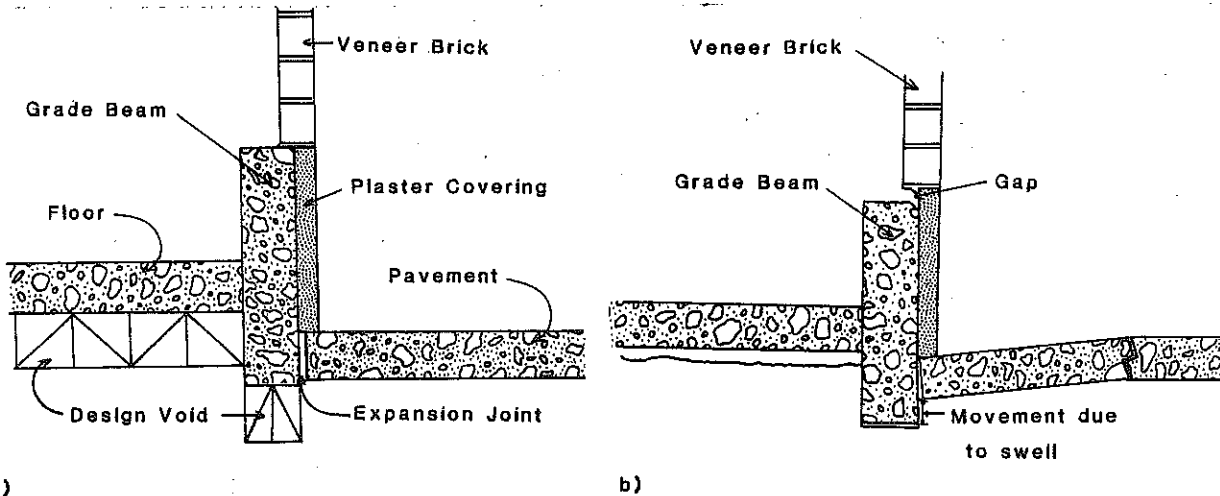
Grade beam and pavement sections for the building shown in Figs. 7 and 8. a) As built b) After soil expansion.
